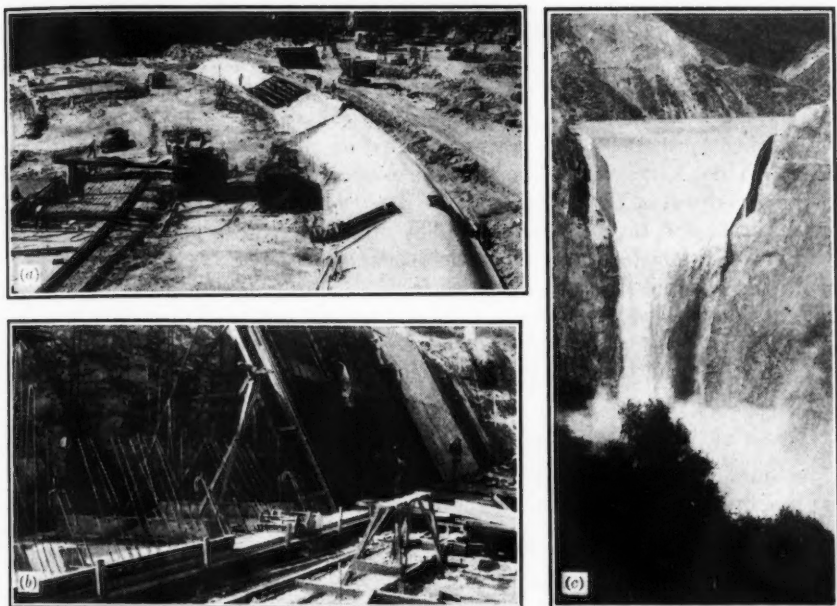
TYPICAL FEATURES OF THE SPILLWAY CONSTRUCTION
